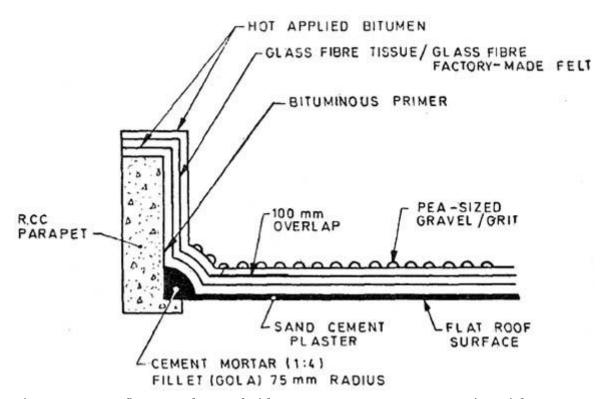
Waterproofing on a Flat Roof with RCC Parapet 450 mm or Less in Height-Typical Details
